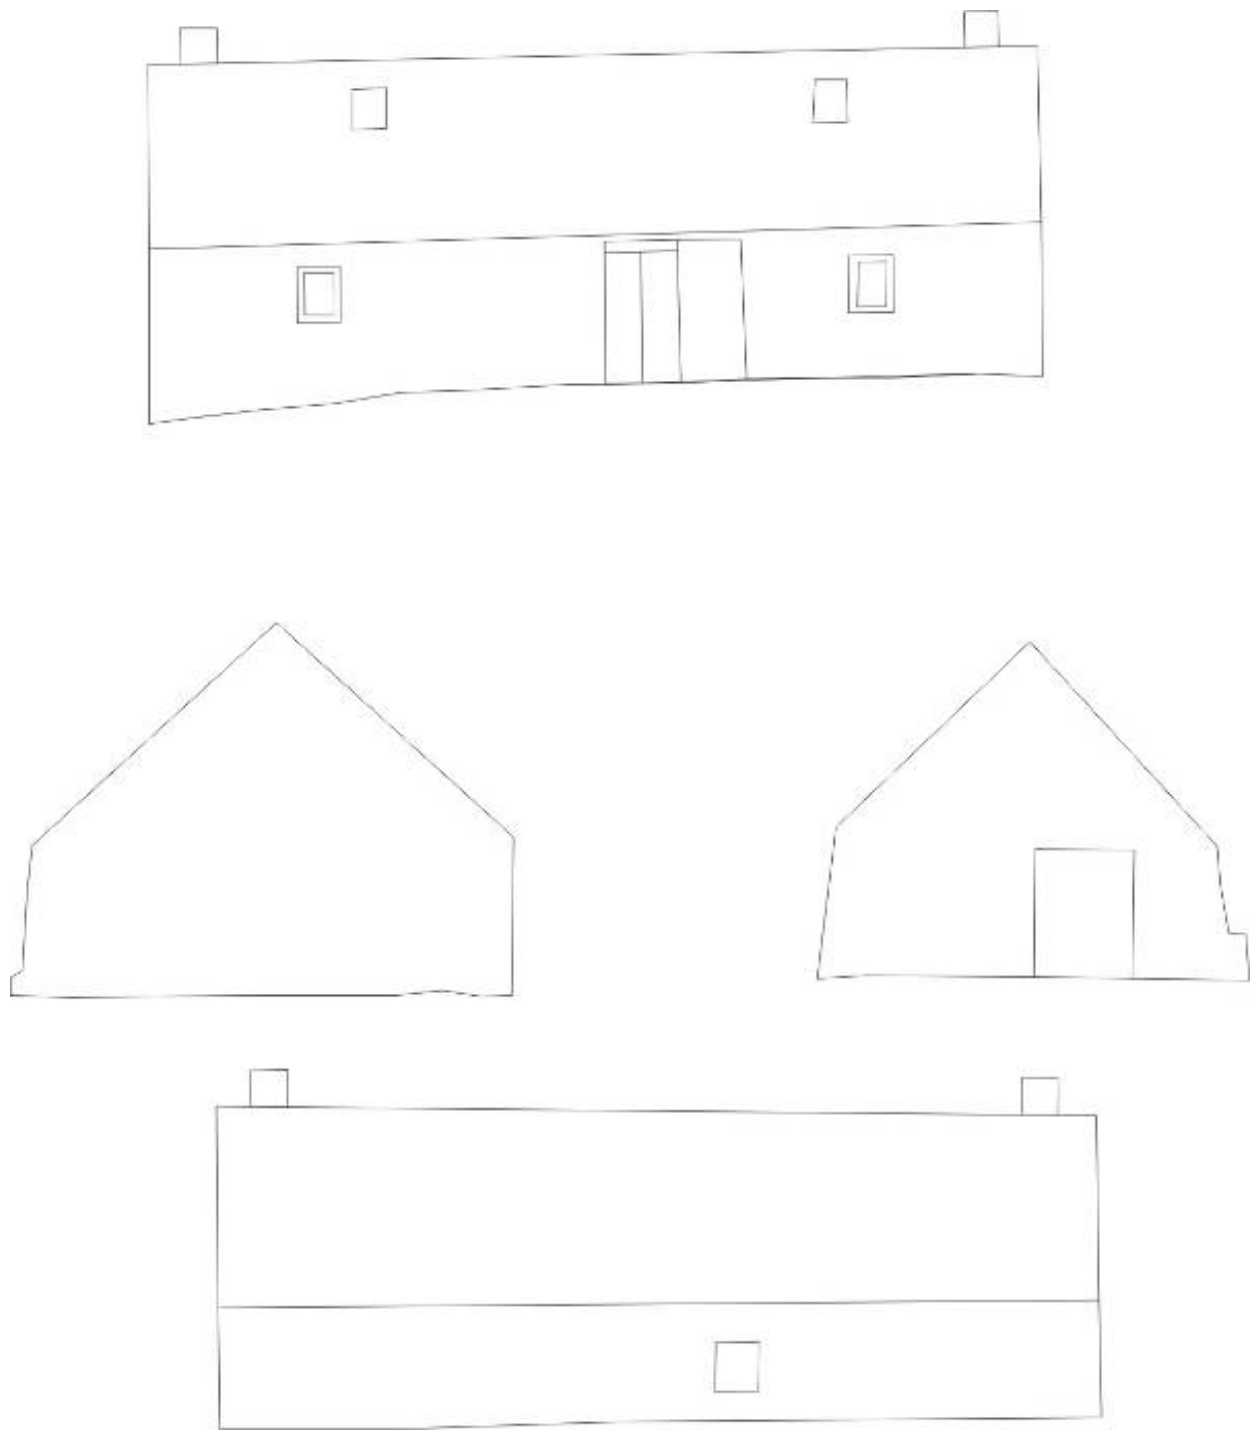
South Western, Northern, Southern and South Eastern elevations of Building 1 Scale 1:100
